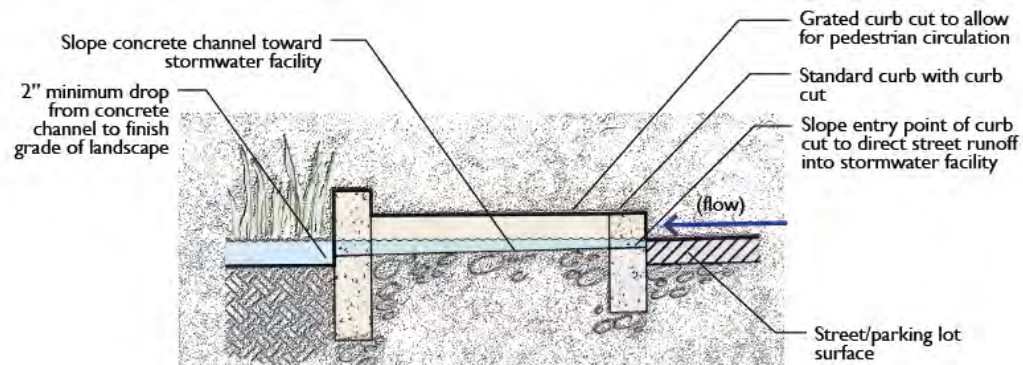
Grated curb cut: section view (Source: SMCWPPP 2009)
